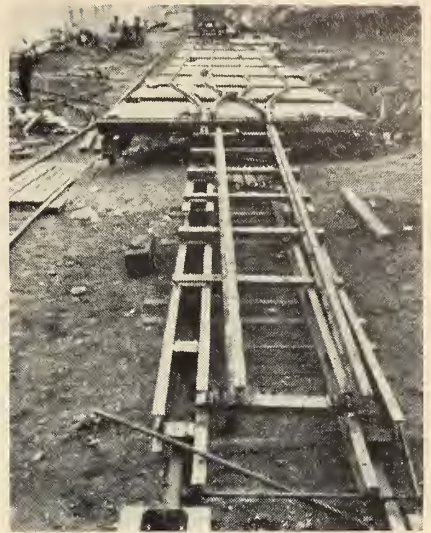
Concreting bridge assembly showing approach ramp and passing tracks.
